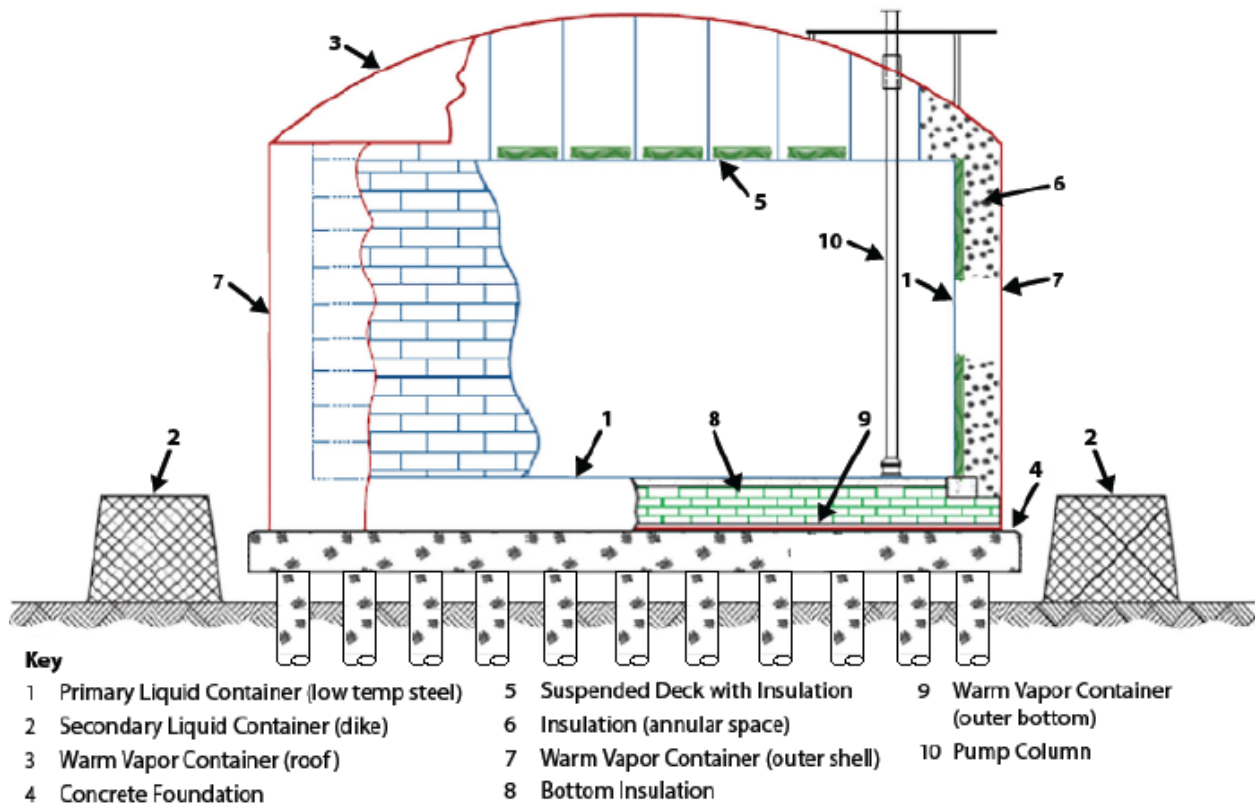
Typical Single-Containment LNG Storage Tank
